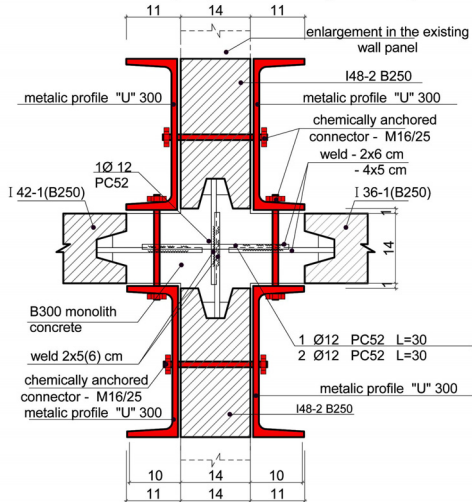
Internal walls consolidation – joint detail – horizontal section.
